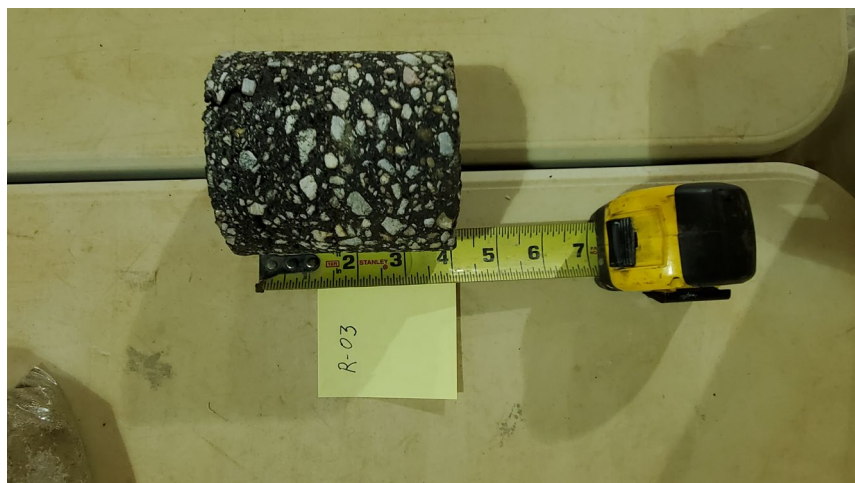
Core at R-03 (Core oriented with asphalt surface to the left)
